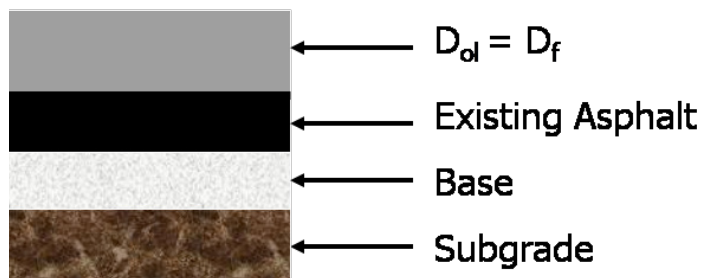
Illustration of Unbonded Overlay of Existing Asphalt Pavement.
